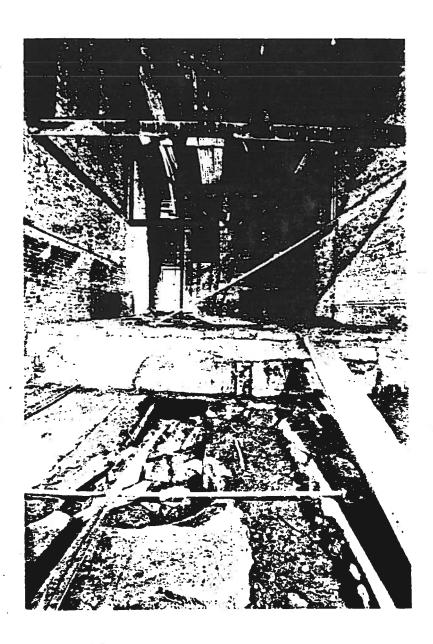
Bluitt's Sanitarium, interior, camera facing south, showing brick-lined well and trench beneath brick and concrete platform (1904).
